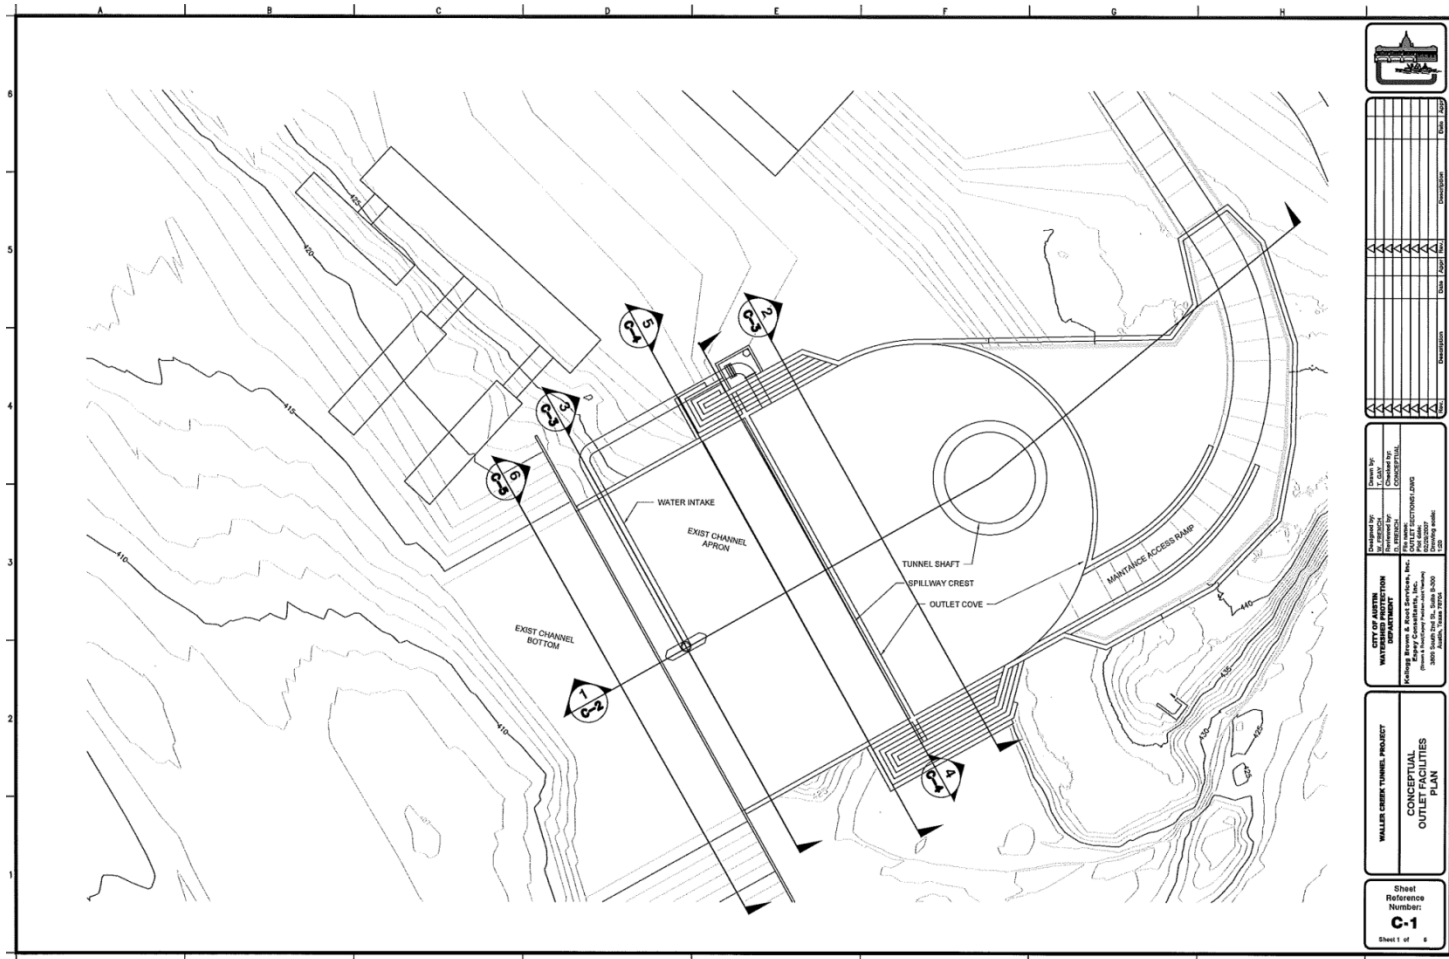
Waller Creek Tunnel Project; Outlet-Plan
